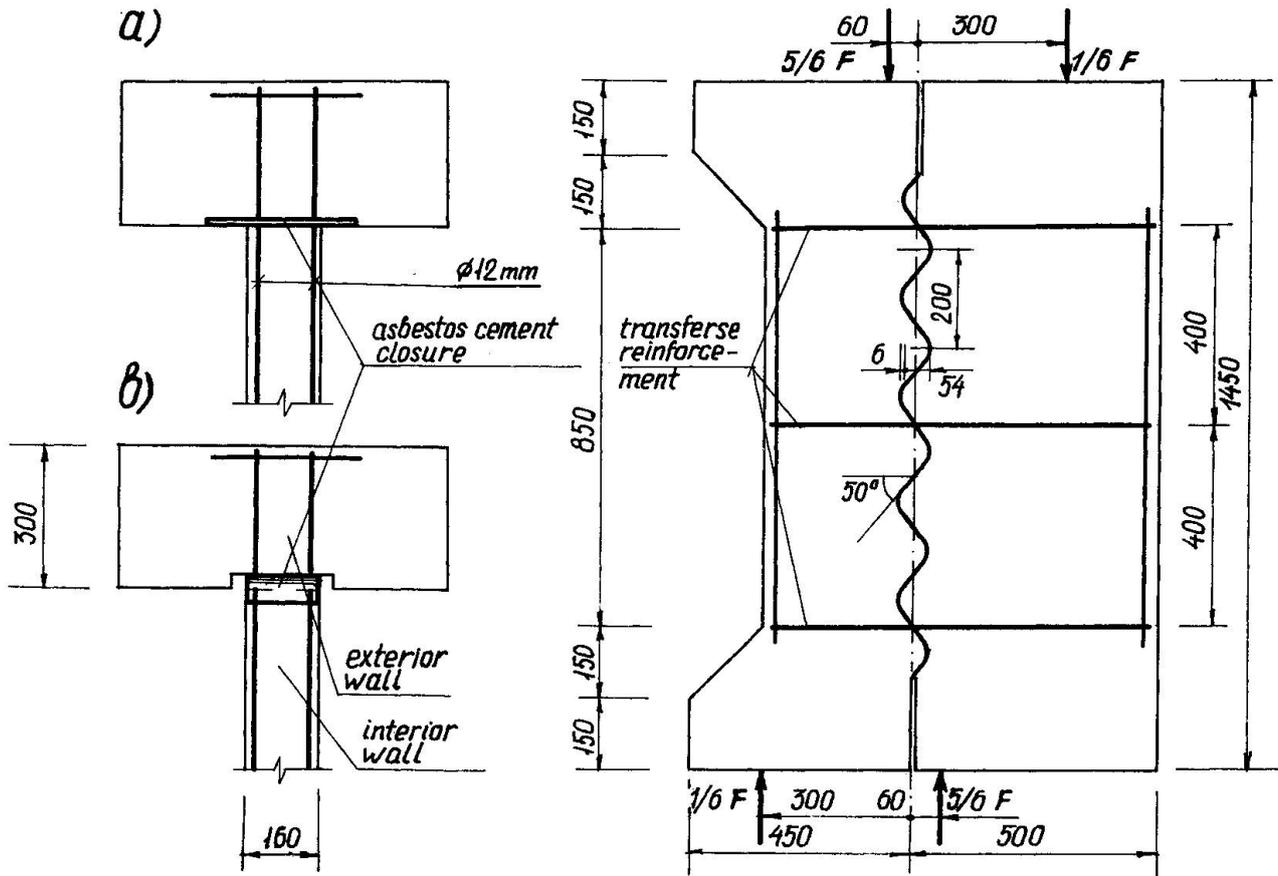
Test specimens and test loading diagram of plain (a) and keyed (b) joints (dimensions in mm)
